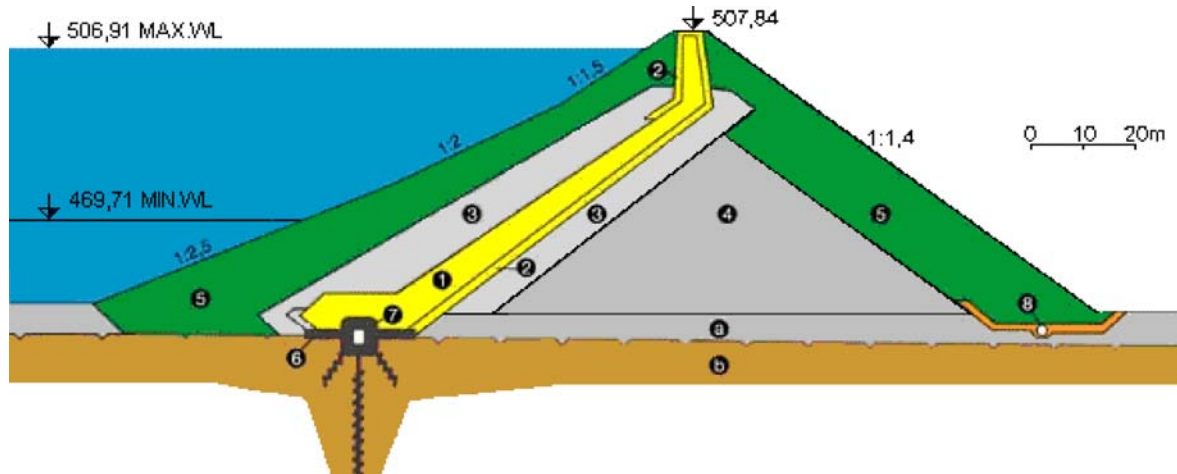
Cross section of the dam - 1 clayey core, 2 filter, 3 gravel, 4 gravel and unsorted quarry stone, 5 crushed quarry sandstone, 6 concrete, 7 grouting gallery, 8 drainage, a alluvial gravel, b sandstone with clayey slate (according [3])
